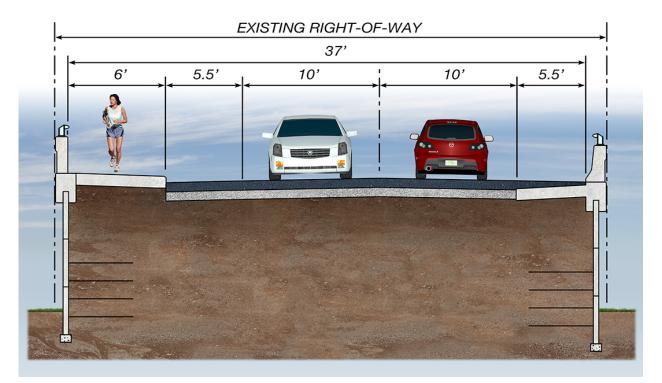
Proposed Roadway Section West of Proposed Fixed Bridge
